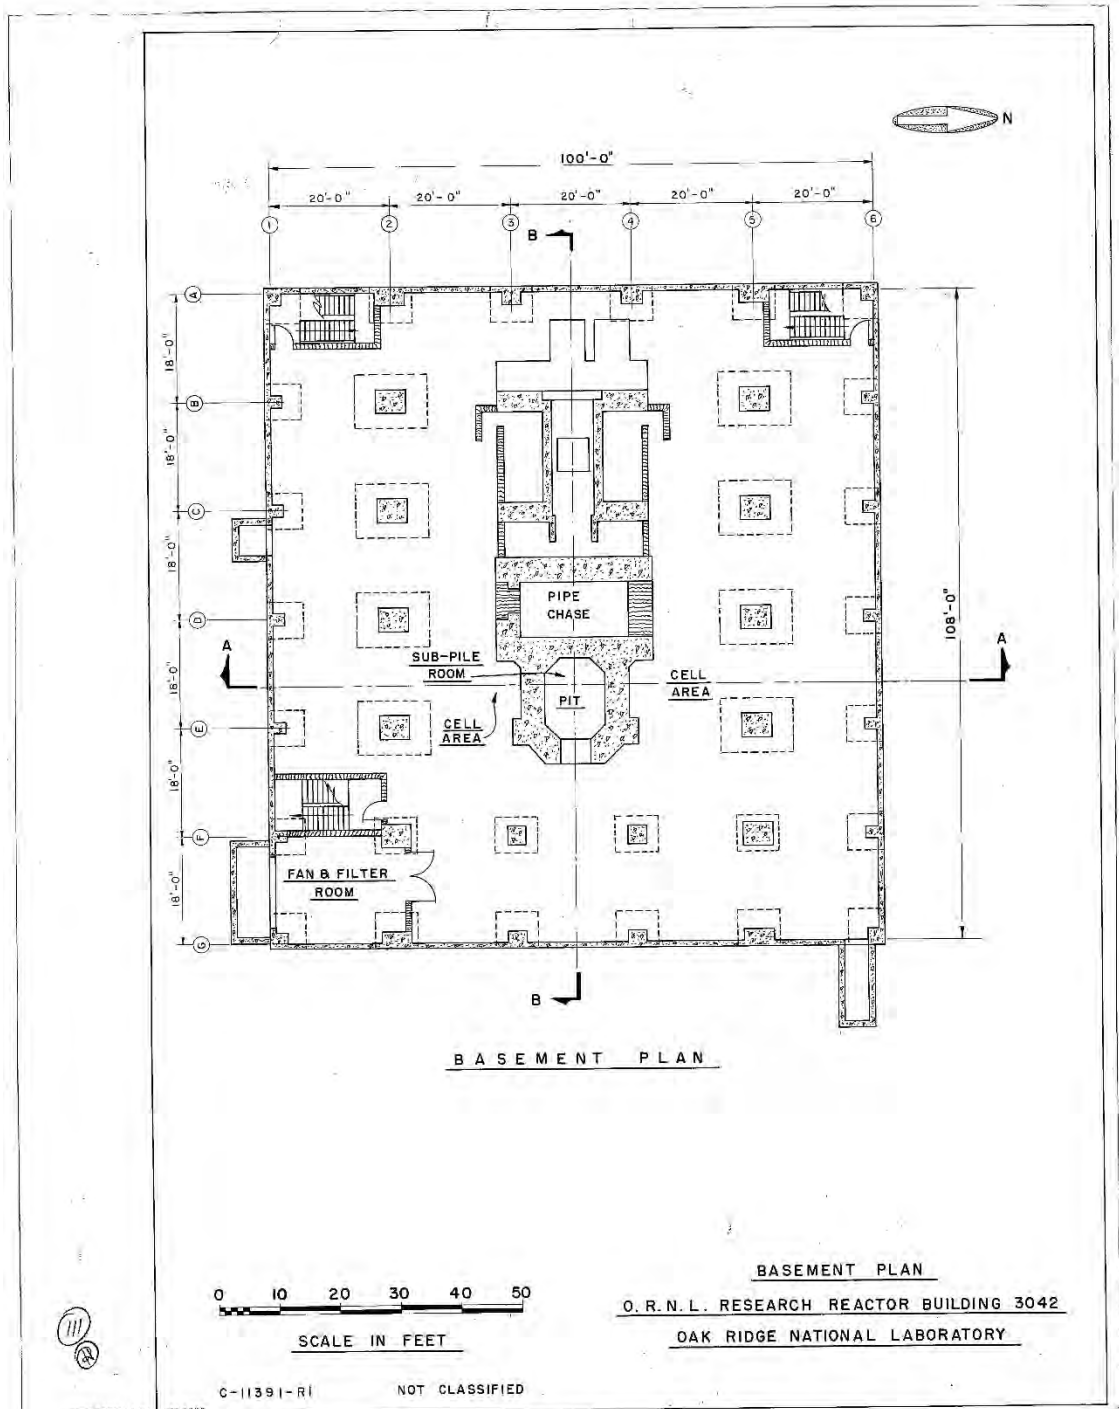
Basement plan for Building 3042 (Oak Ridge National Laboratory, n.d.).
